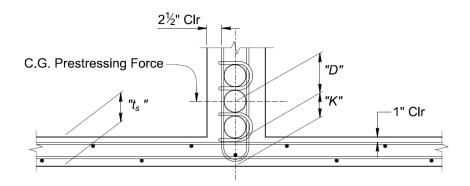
Prestress Duct Configuration for Curved Girder with "Detail A"
